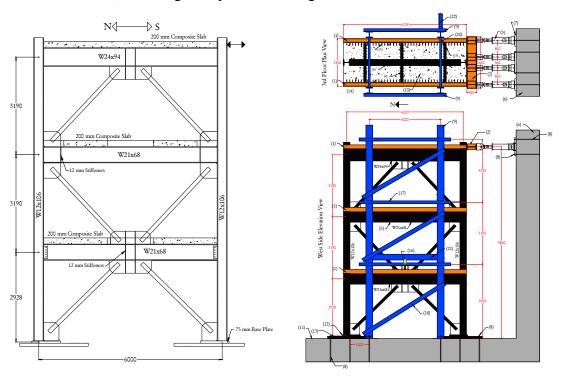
TCBF2 Test Frame and Setup (TCBF2-1 shown)
